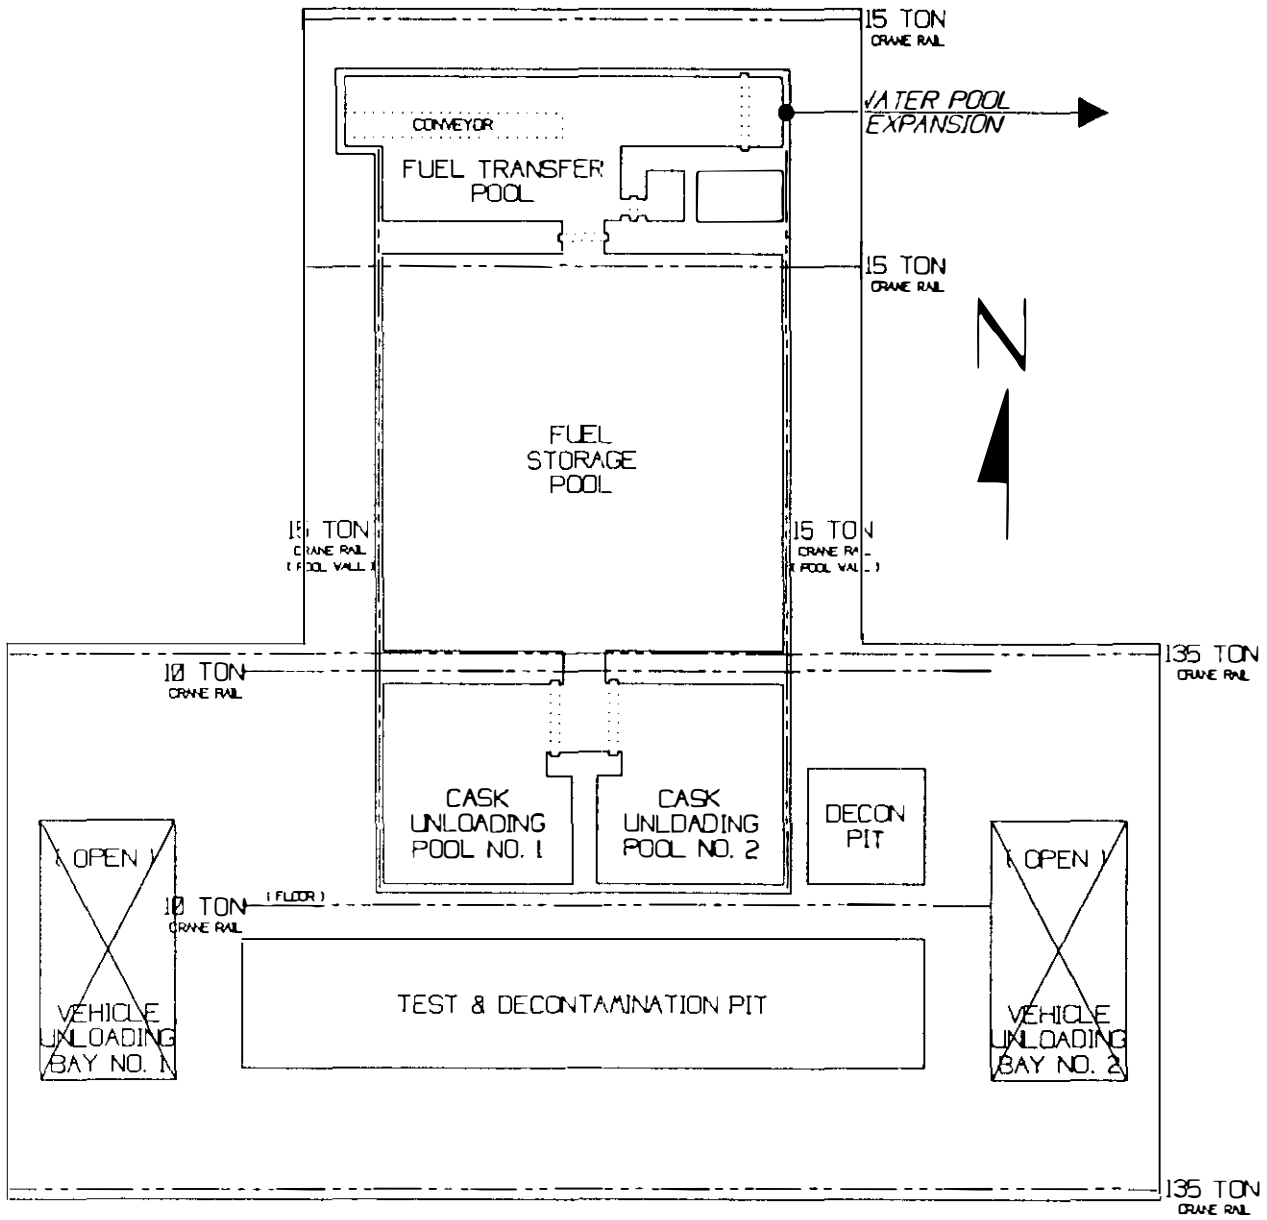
Plan view of the Barnwell Plant Fuel Receiving and Storage Station.
